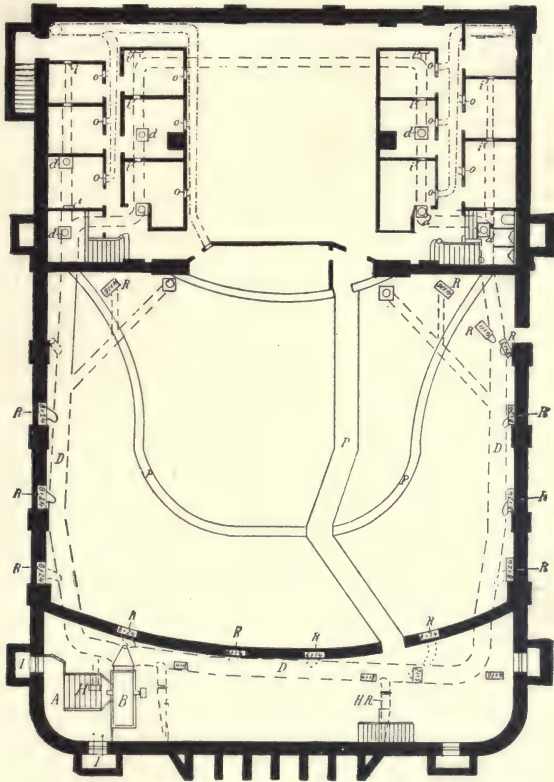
EMPIRE THEATER.—FLOOR PLAN.
